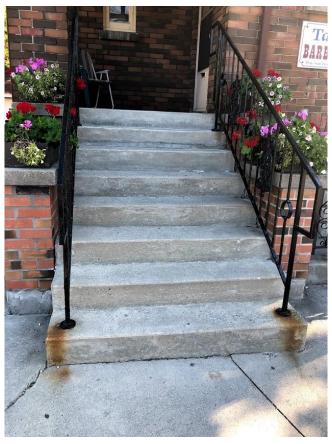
View of stairs to front porch on front elevation of the building located at 1110 Richmond Street
